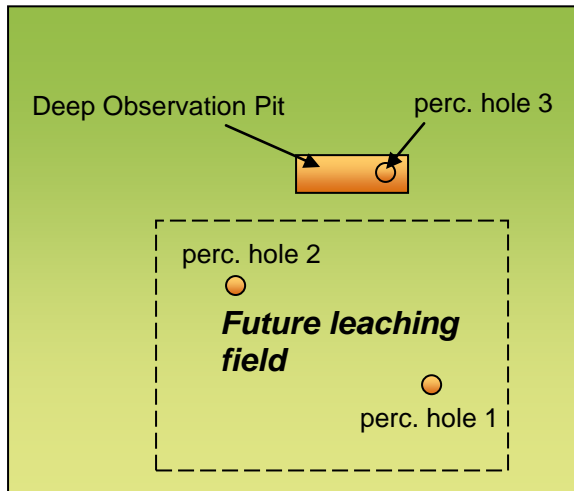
The deep observation pit should be located just outside the proposed future leaching field or stormwater infiltration system.
